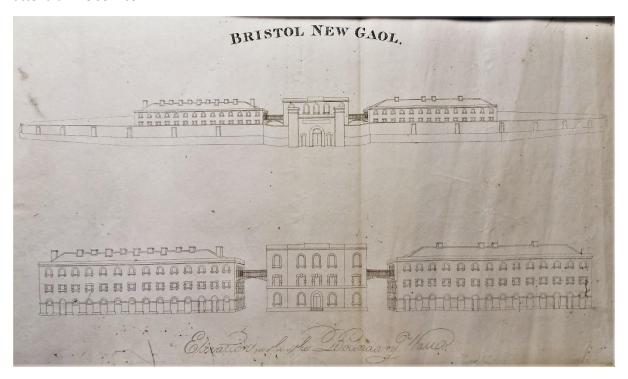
Bristol New Gaol. Elevation, with and without the boundary wall. The steel bridges connecting each wing with the prison chapel on the top floor of the governors' house can be clearly seen. Bristol Public Libraries, Braikenridge Collection III, I/125.
